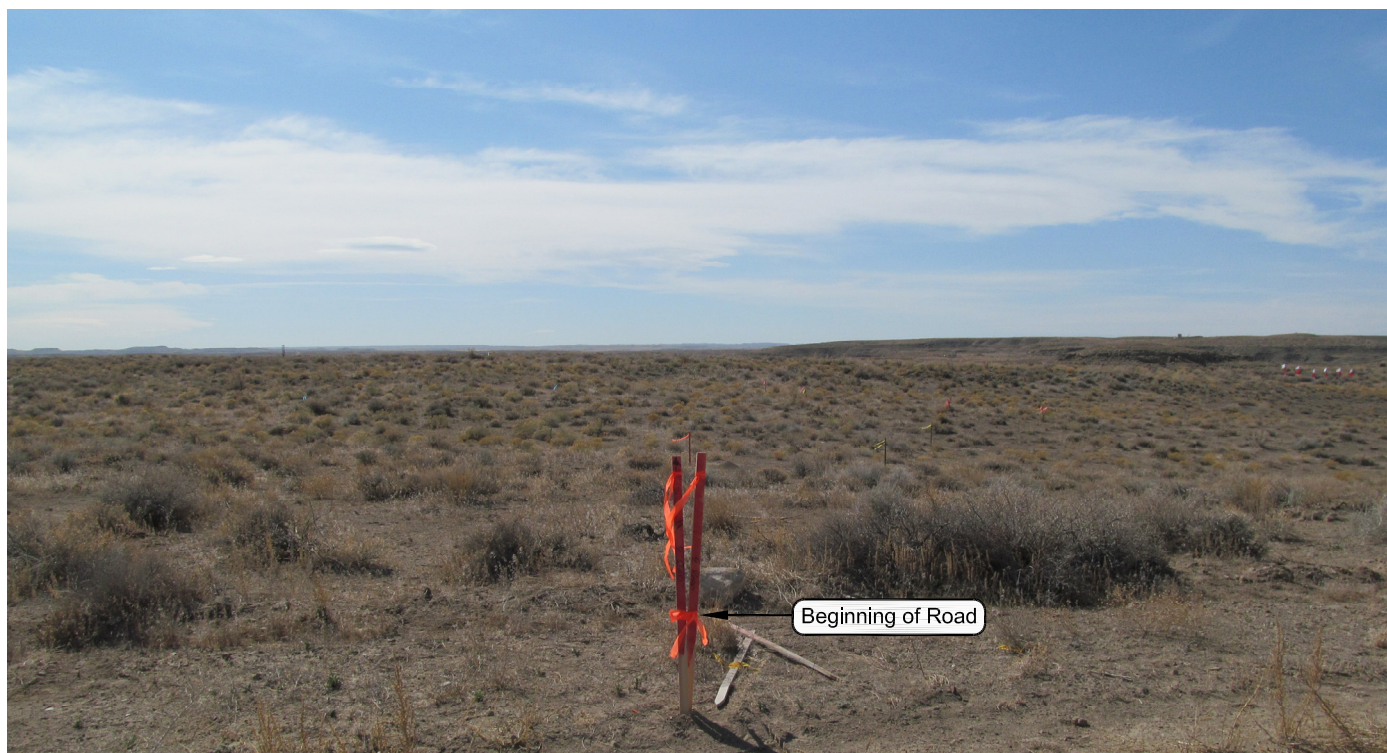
PHOTO VIEW: FROM BEGINNING OF PROPOSED ROAD
